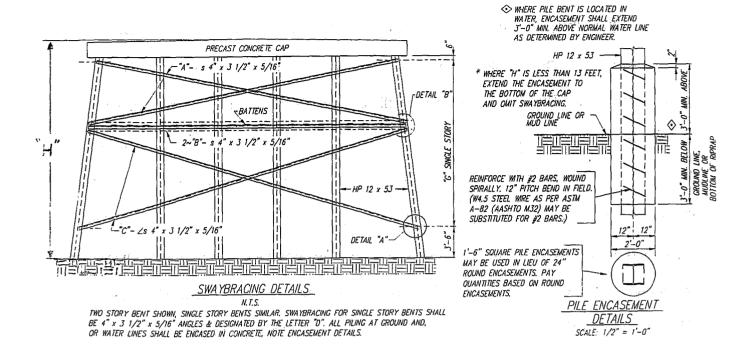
Typical ALDOT Bridge Pile Bent with Pile Encasement Details
